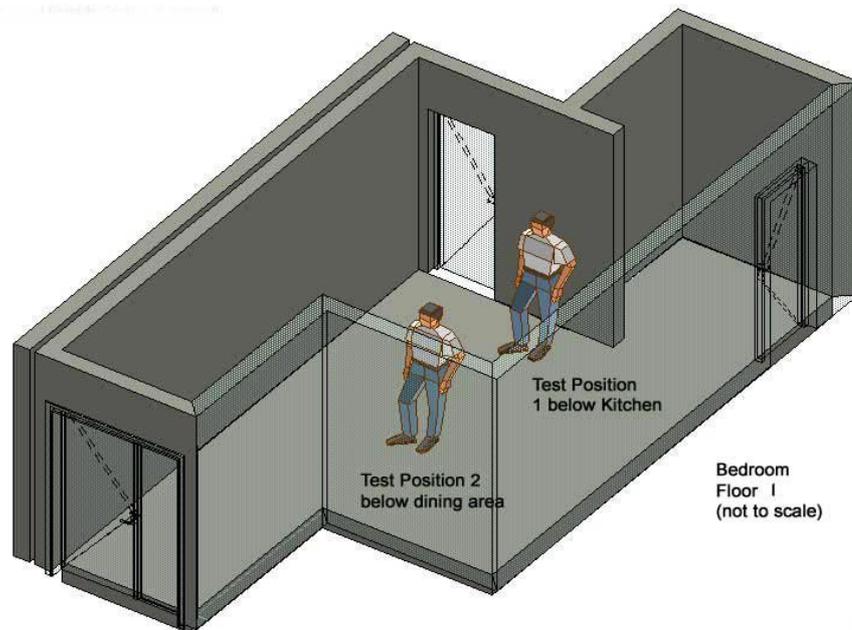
AXONOMETRIC BEDROOM FLOOR 1 (not to scale)
